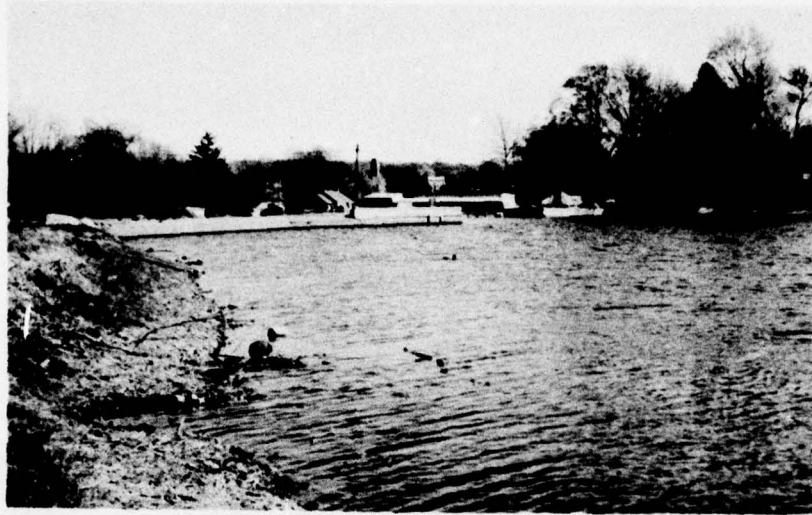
Upstream face of the dam from left shore of White's Pond Dam
